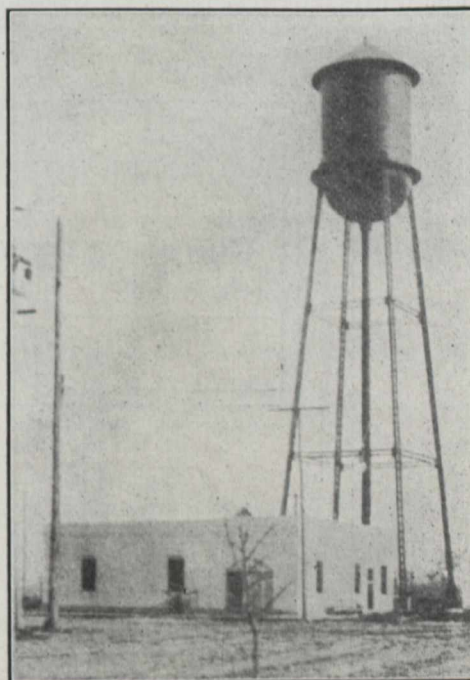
Exterior View of Pumping Station and Elevated Tank.
